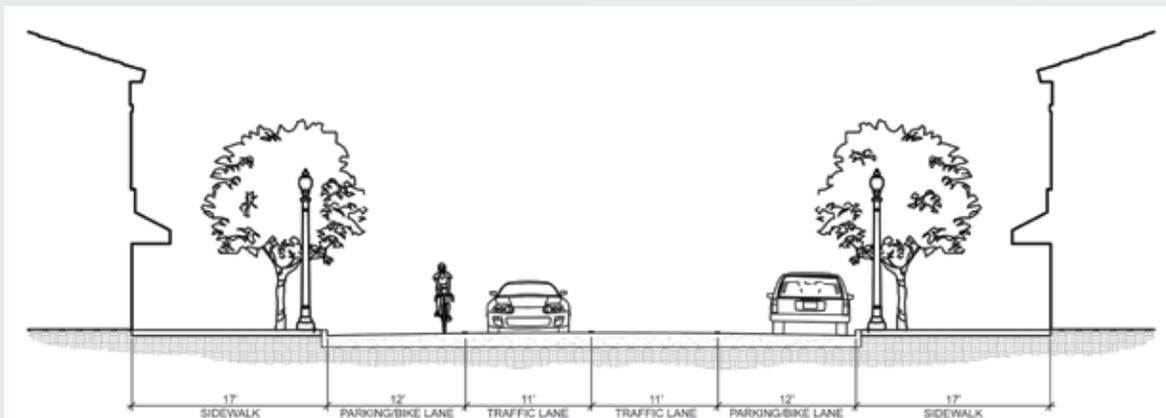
Proposed cross section of Orange Avenue between 1st Street and 6th Street
